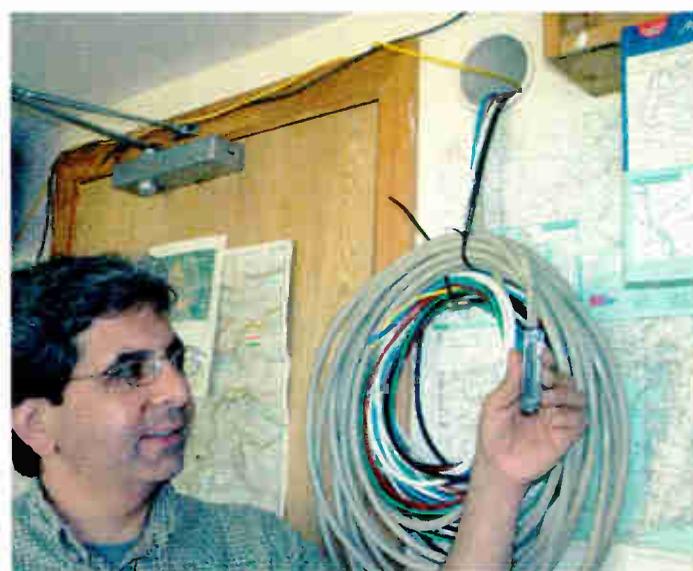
The raceway entry into the studio has room for plenty of cables.
